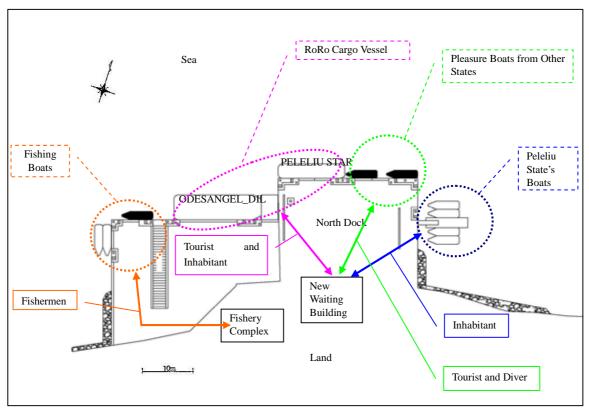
(2)-2 Zoning of Extended Pier in North Dock
